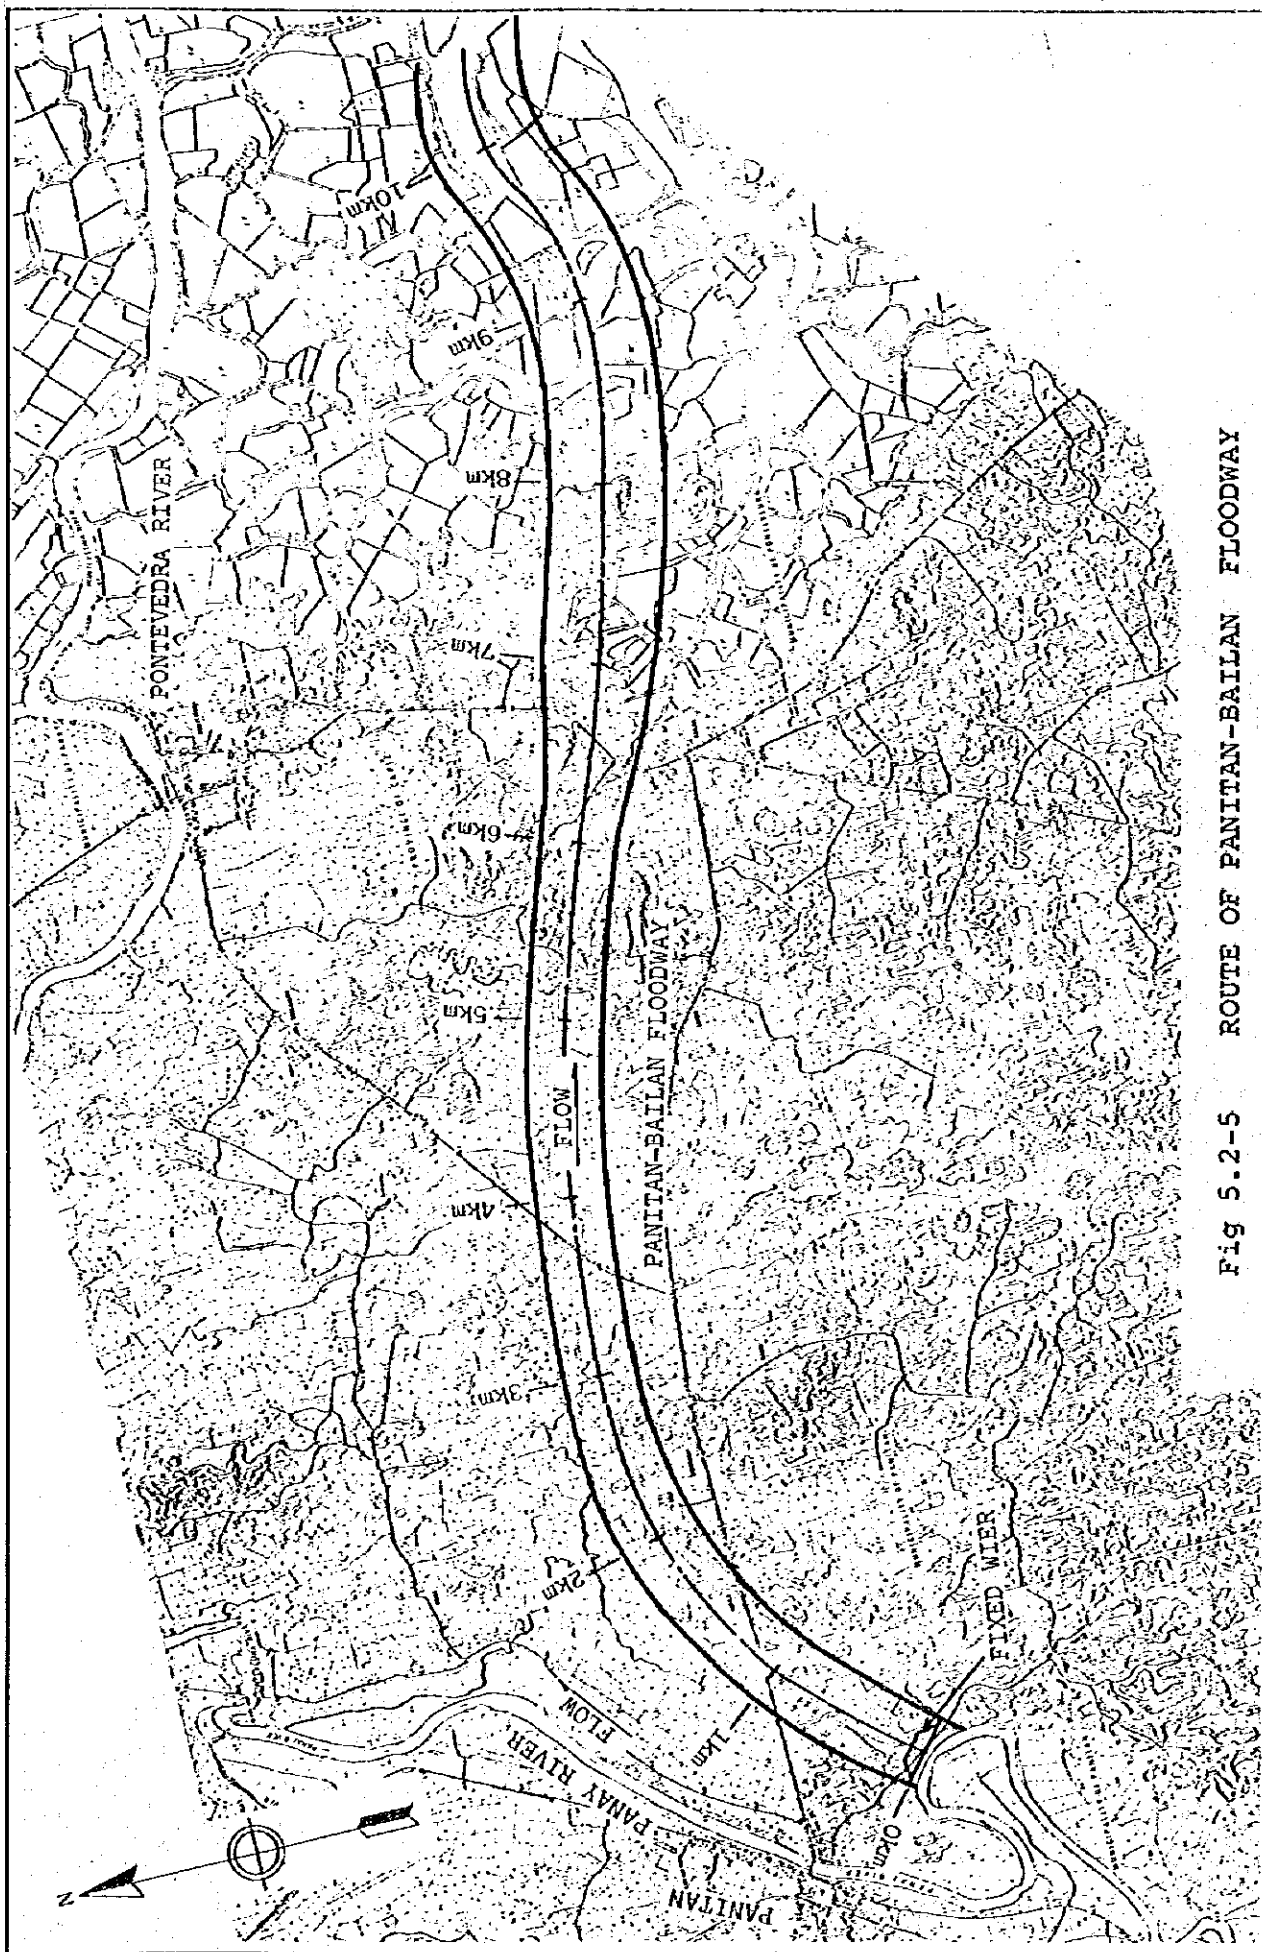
ROUTE OF PANITAN-BAILAN FLOODWAY
